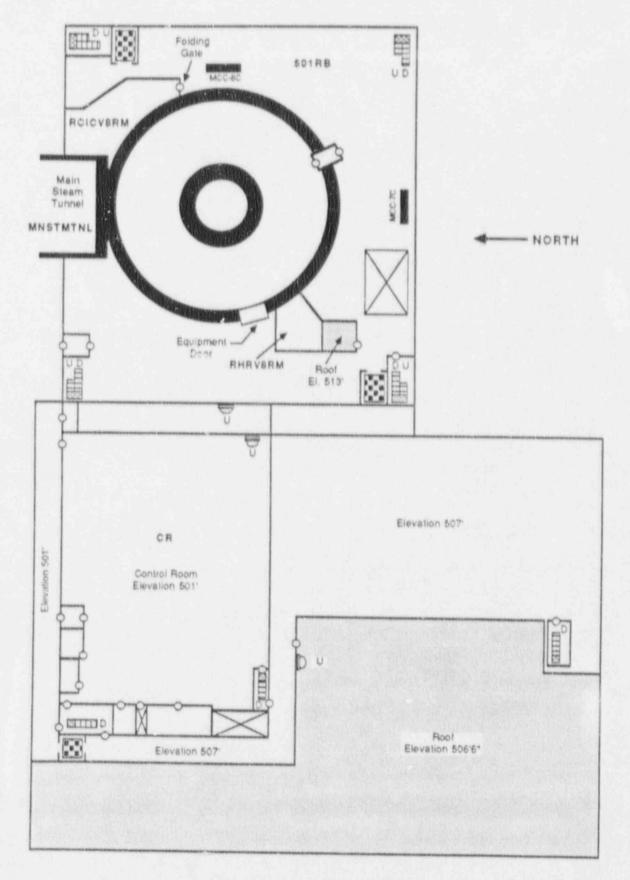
WNP-2 Reactor Building, Elevation 501' 0" and Control and Radwaste Buildings, Elevations 501' 0" and 507' 0"
